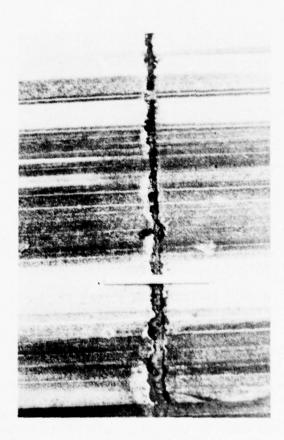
Low Severity Joint Spalling. (If the Frayed Area Was Less Than 2 Feet Long It Would Not Be Counted.)
